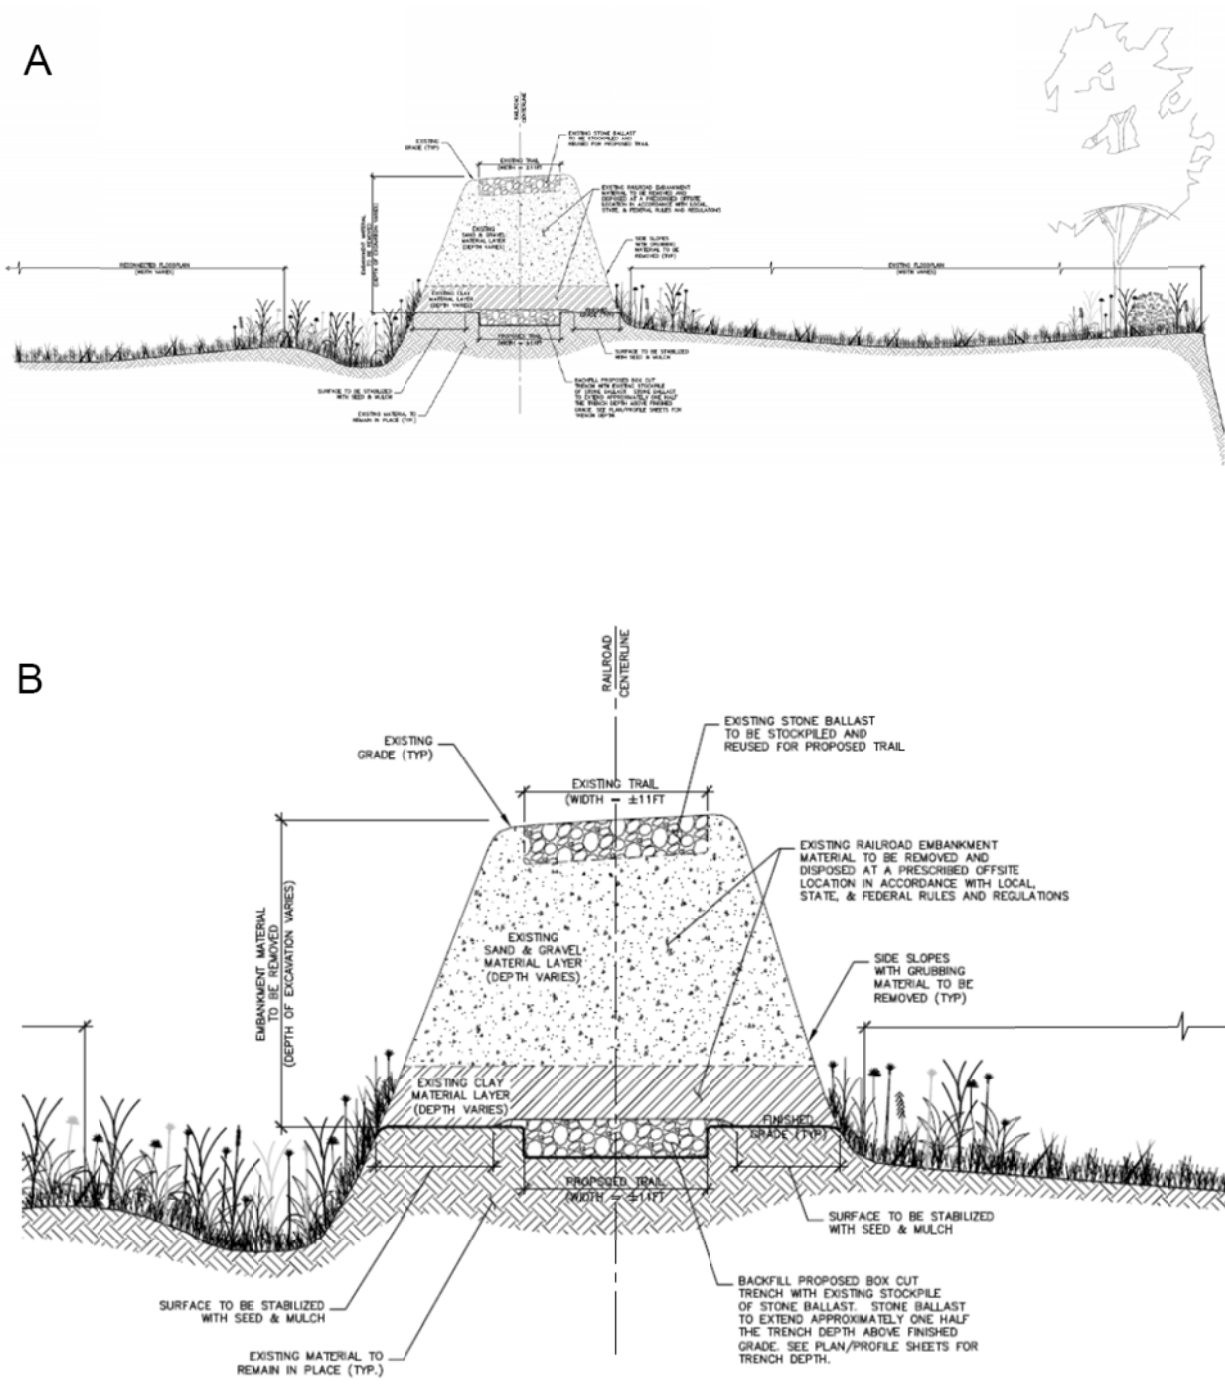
Typical section full size (A) and zoom (B) showing floodplain restoration by removal of a railroad embankment. (Source: Milone & MacBroom, Inc.)
